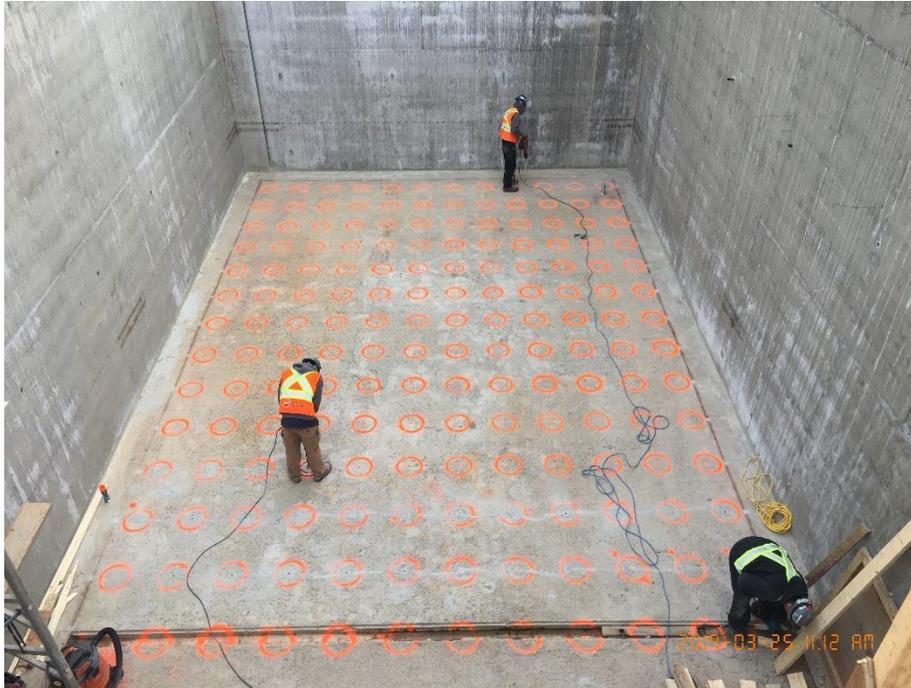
McLoughlin Point Wastewater Treatment Plant: drilling biological aerated filter cell 2 floor anchors.
